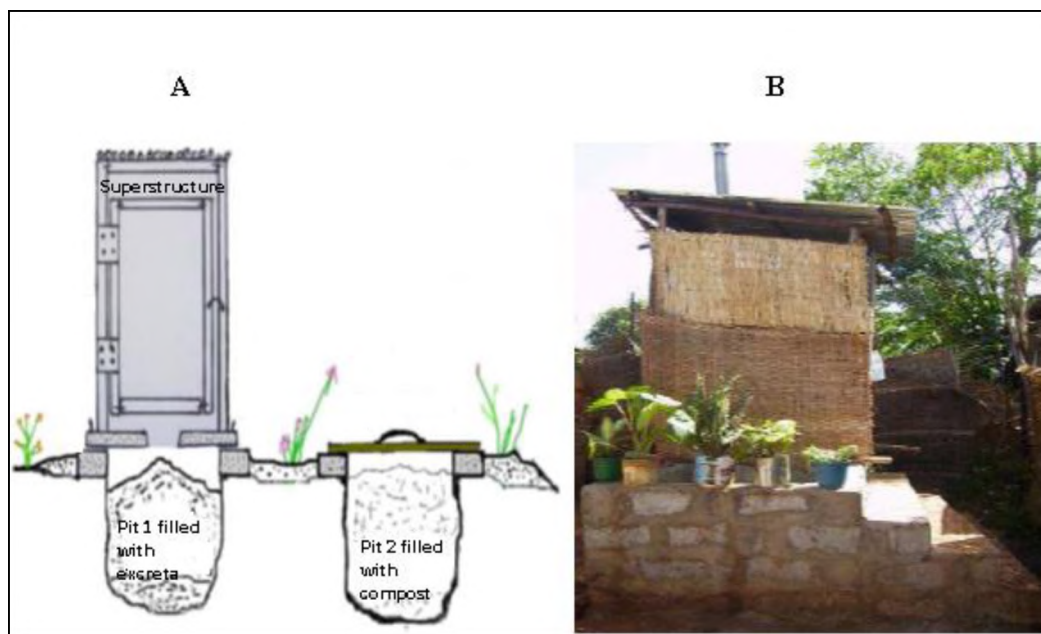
(A) Functioning of a Fossa Alternata and (B), an elevated Fossa Alternata (source: Morgan 2007)
